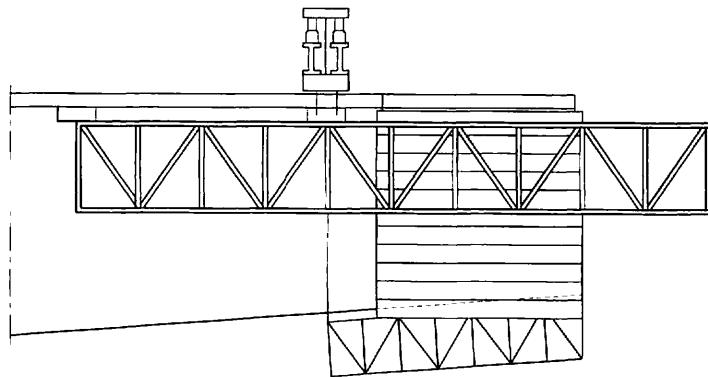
Free cantilevering of the Felsenau bridge – Switzerland [14]
